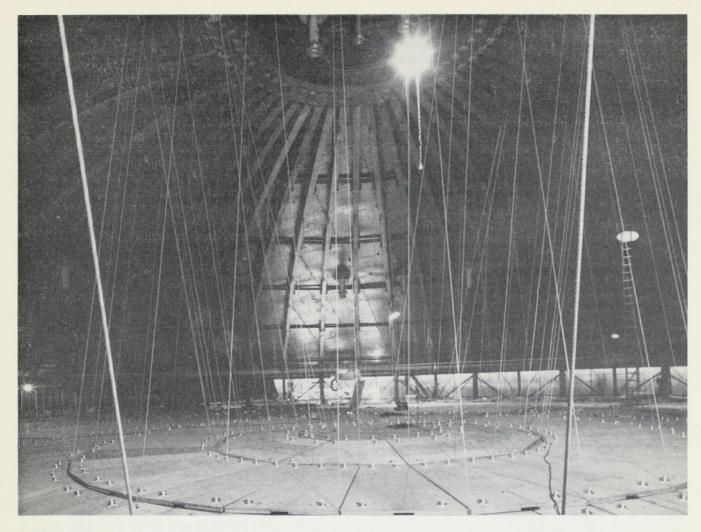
PHOTOGRAPH SHOWING A TYPICAL SUSPENDED DECK ARRANGEMENT
